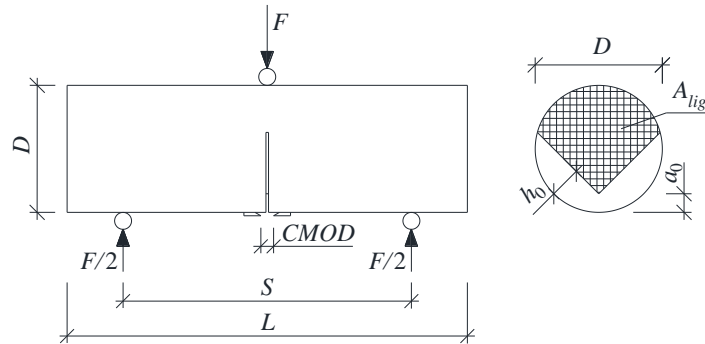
Scheme of three-point bending fracture test of specimen with Chevron type initial notch.
